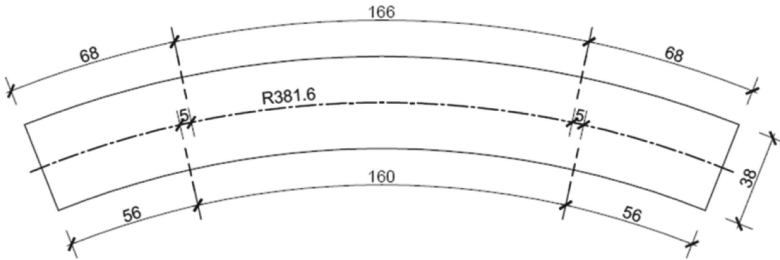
Top view of the printed specimens, fabricated to investigate two reinforcement alternatives above a window opening (dimensions in [cm])
